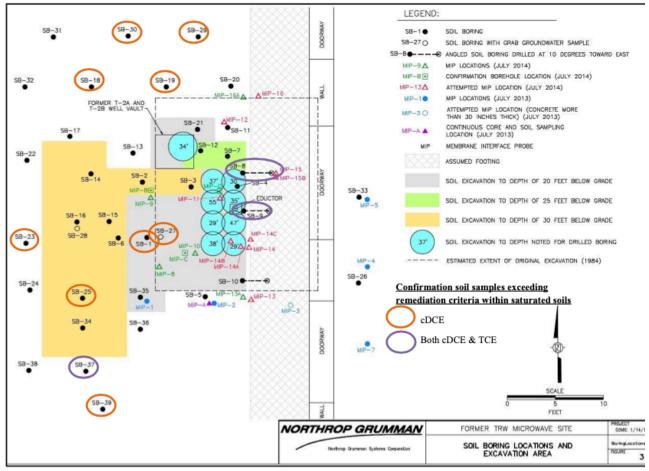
TRW 2014 Soil Excavation and Boring Locations
